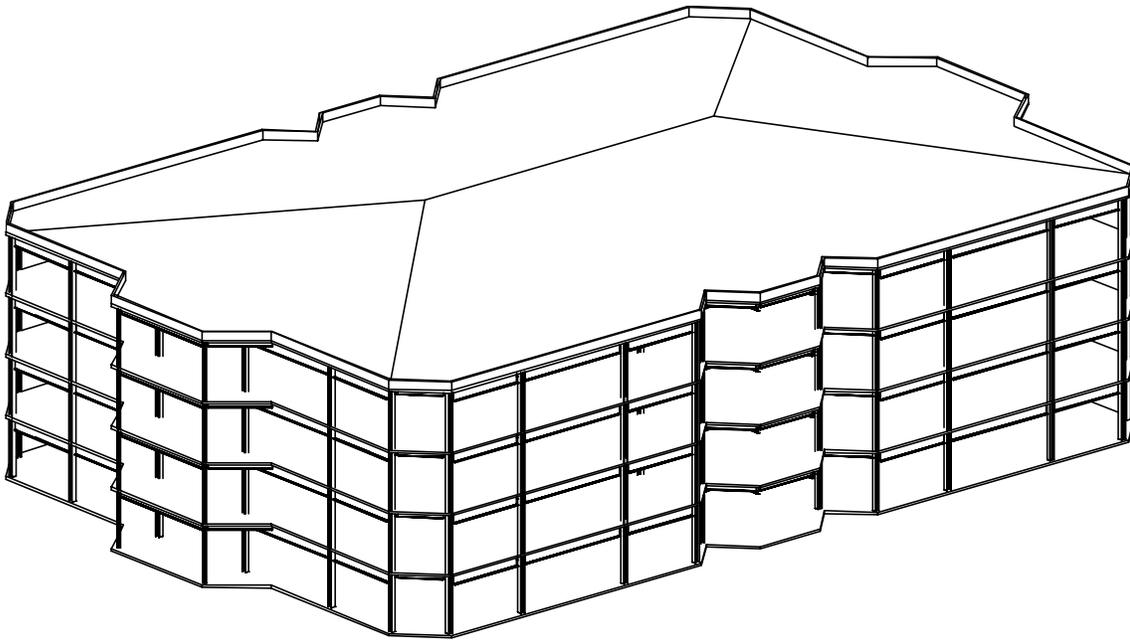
A-1. Four-story steel office building with steel special moment resisting frames (SMRF)
